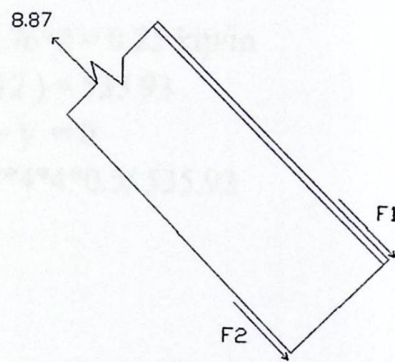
weld between diagonal member and gusset plate
